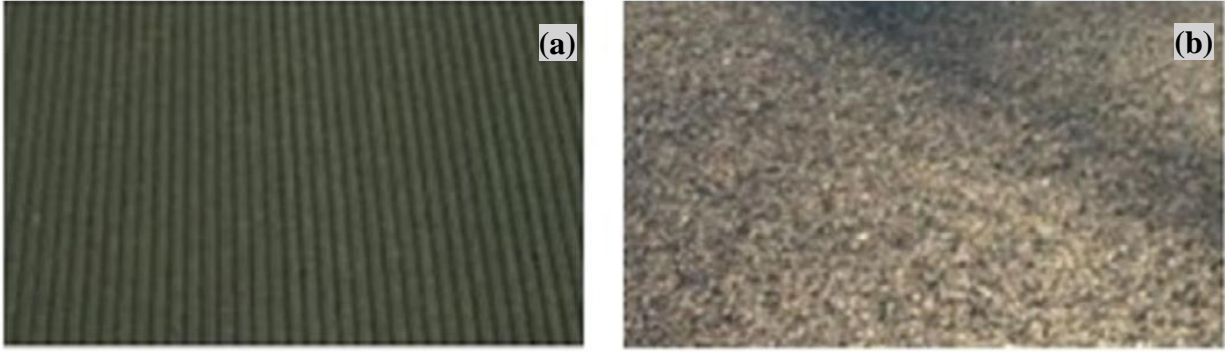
(a) Anisotropic pavement surface, like the one found in a portland concrete pavement; (b) Isotropic pavement surface like the one found in a new asphalt concrete pavement (15).
